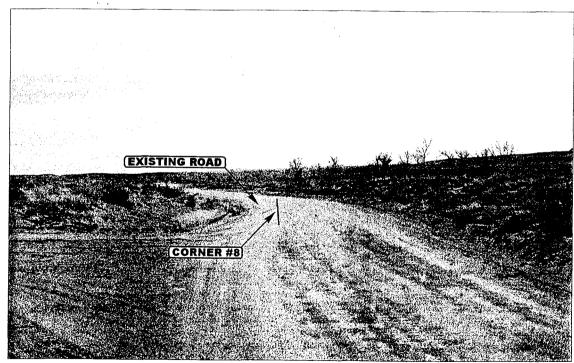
PHOTO: VIEW OF CORNER #8 AND EXISTING ROAD
